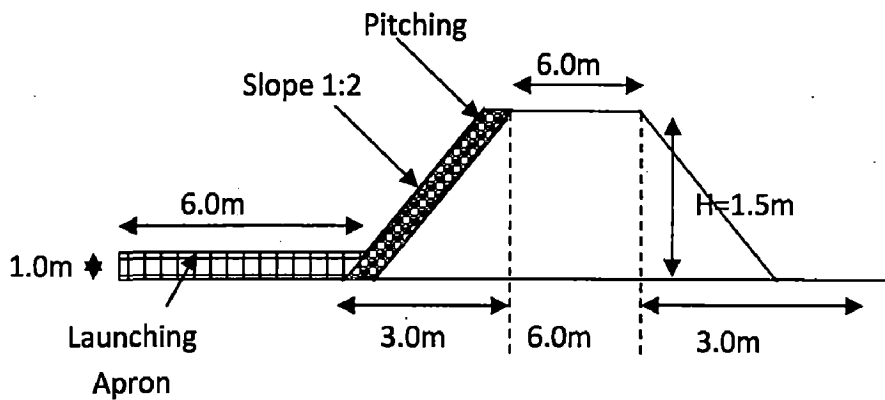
Tentative Details Showing Embankment Section suggested on the left and right b to avoid bank spill
